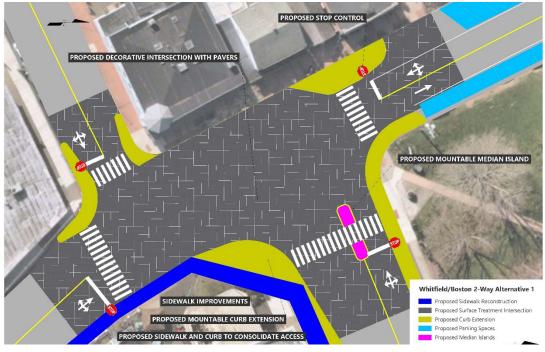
Water Street/Whitfield Street/Boston Street Two-Way Alternative 1
